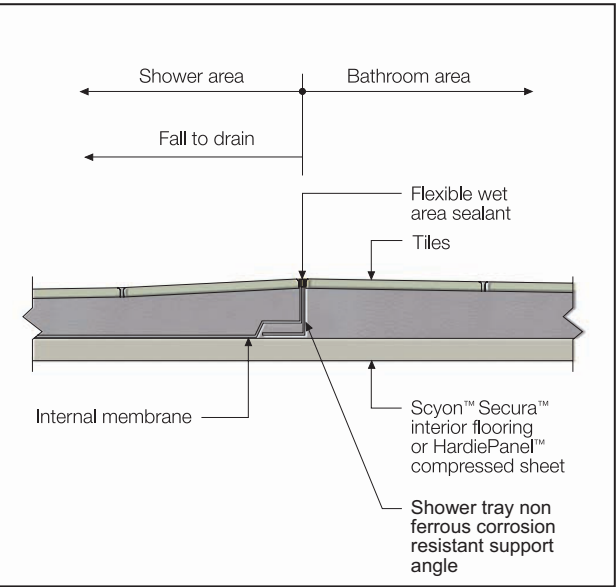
UNENCLOSED Sh Ower - EDGE FINISHING DETAIL
